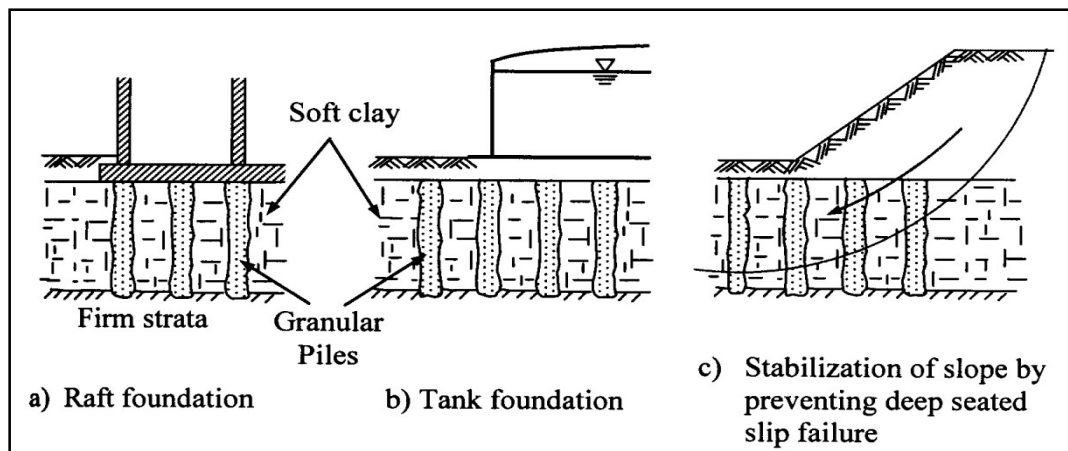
Typical applications of stone columns (Brauns, 1978)
